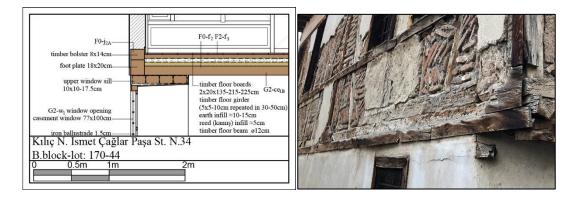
Connection detail 2, section drawing of floor beams located at the same level with the foot plate; timber post of timber framed wall located on the bolster on top of foot plate (Kubbeli N. b.block-lot: 170-44)
